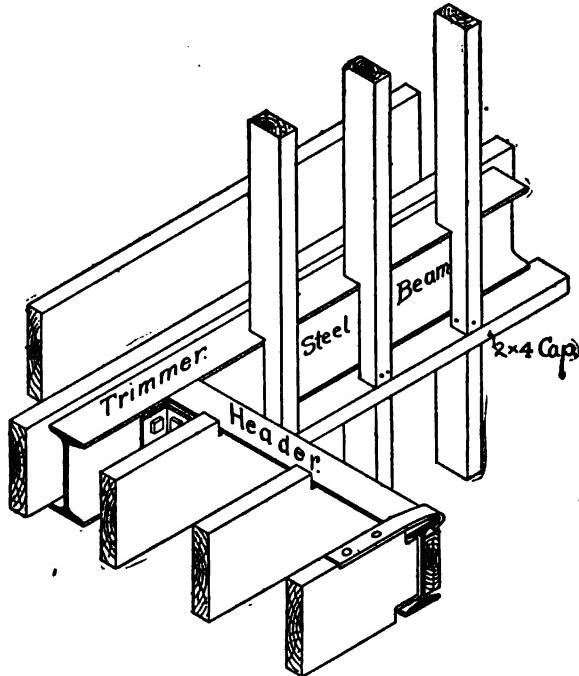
Framing Supported on Steel I Beams Around Floor-Openings.
